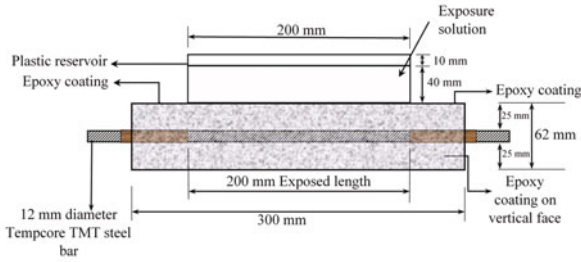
Schematic diagram of prismatic reinforced concrete specimen
